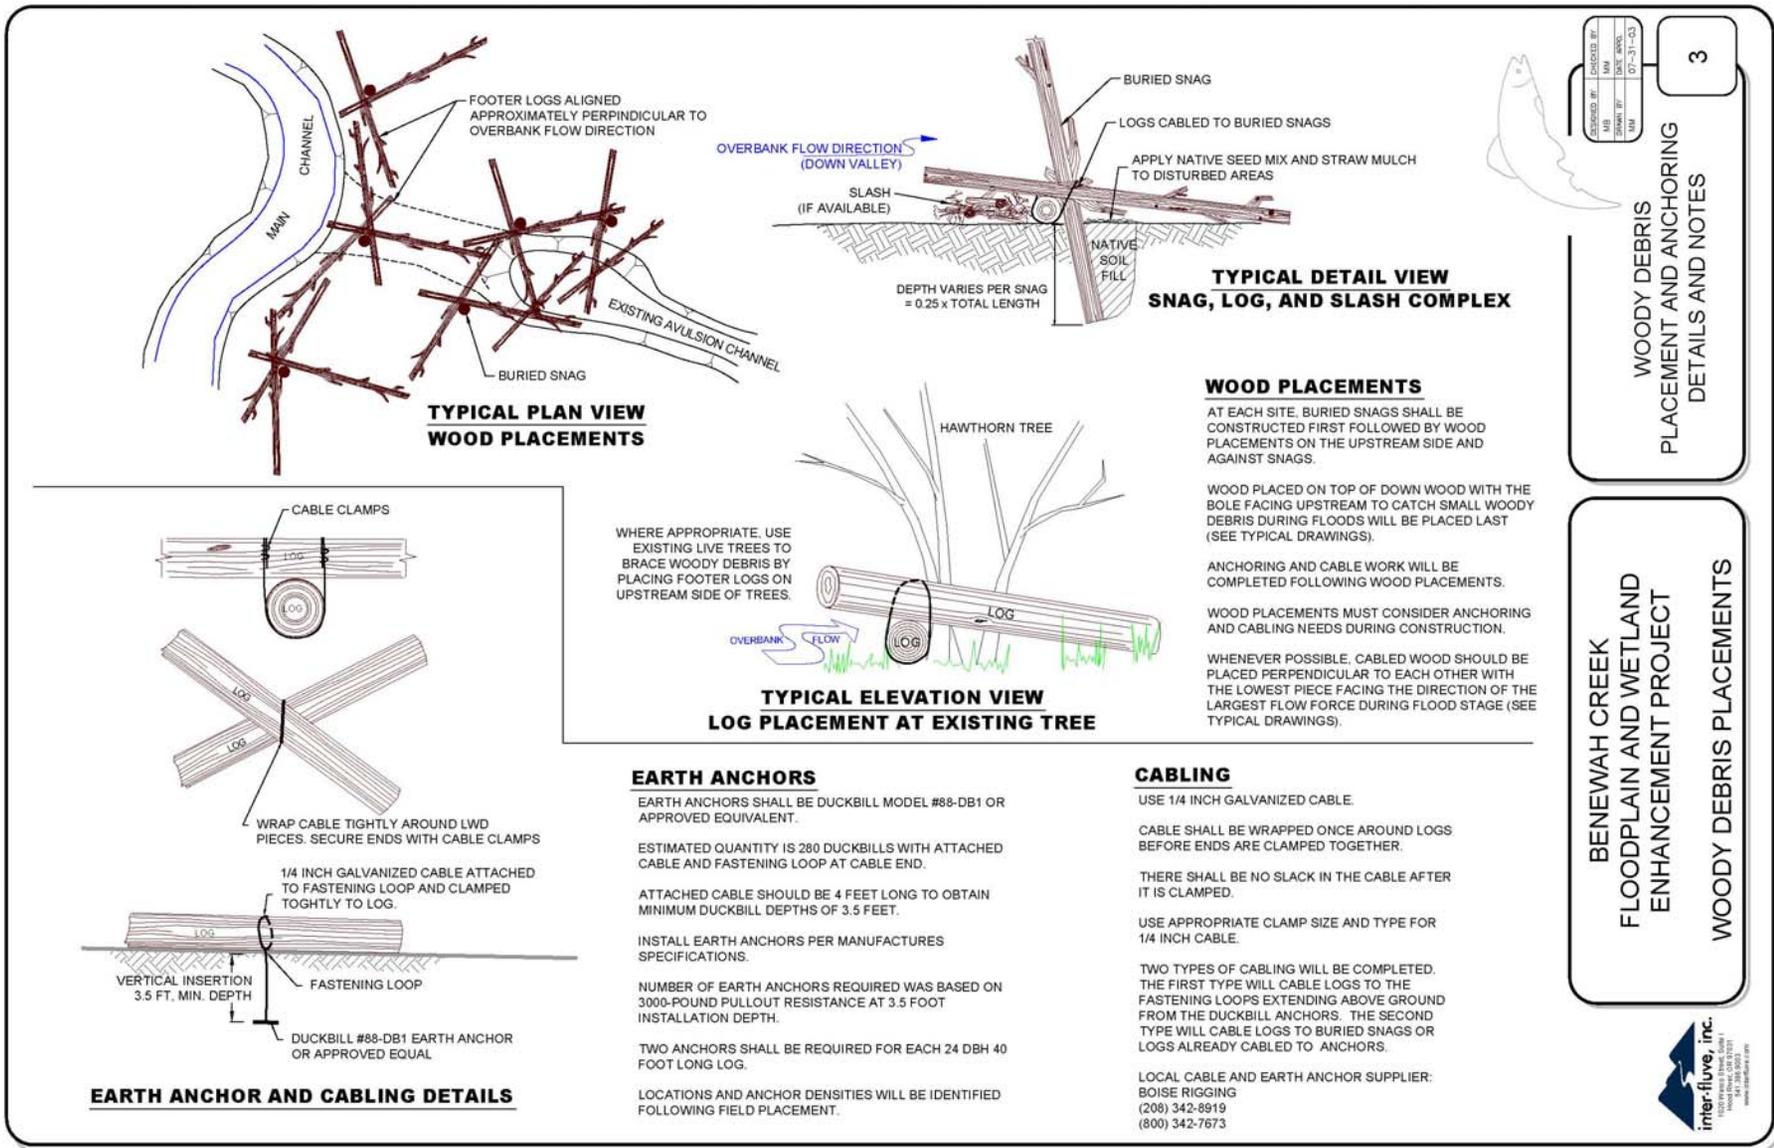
Details and specifications for floodplain wood placements in the Benewah Valley.
